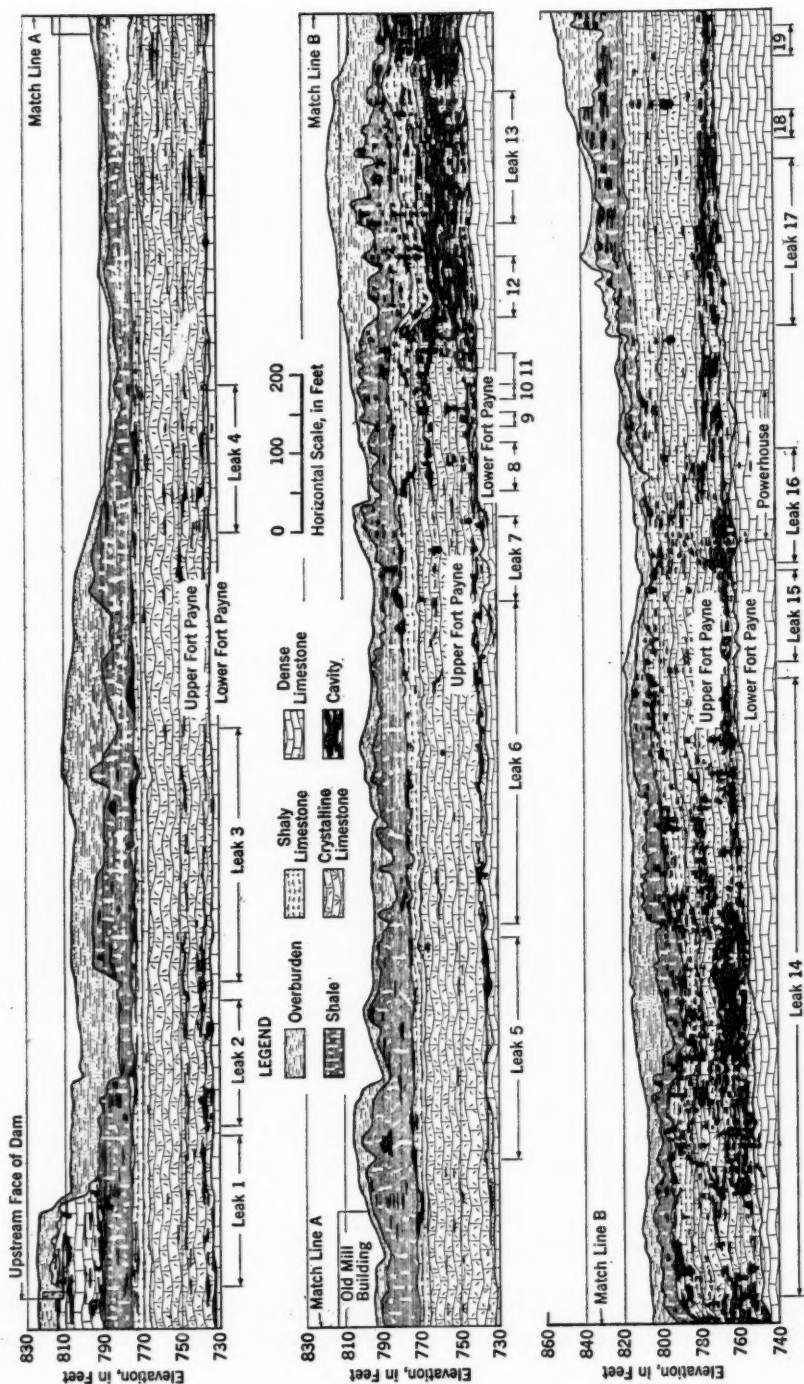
GEOLOGIC SECTION ALONG LINE OF GROUT CURTAIN, BETWEEN THE DAM AND THE POWERHOUSE
